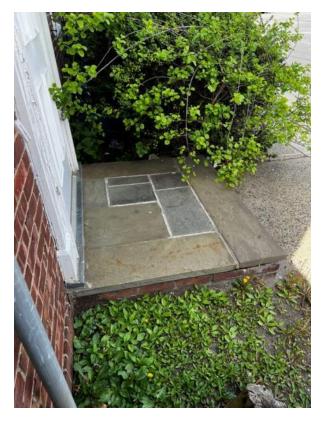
IMG_1017 - East Façade - Emergency exit door with non-compliant landing/elevation.
